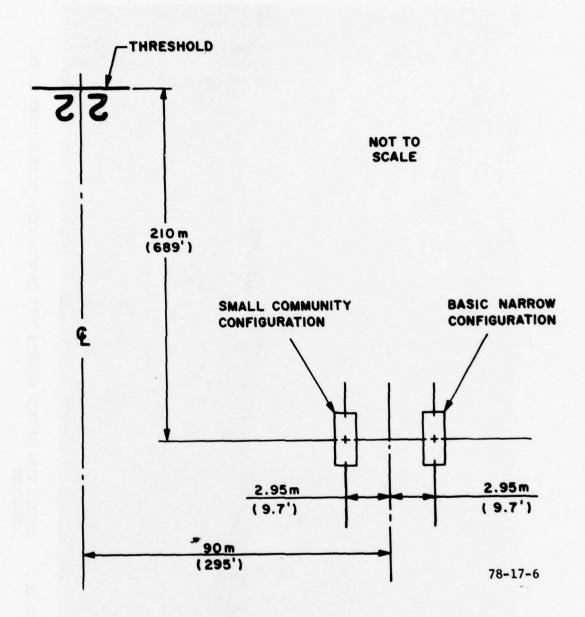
DIAGRAM OF TRSB COLLOCATION ON ELEVATION SITE
